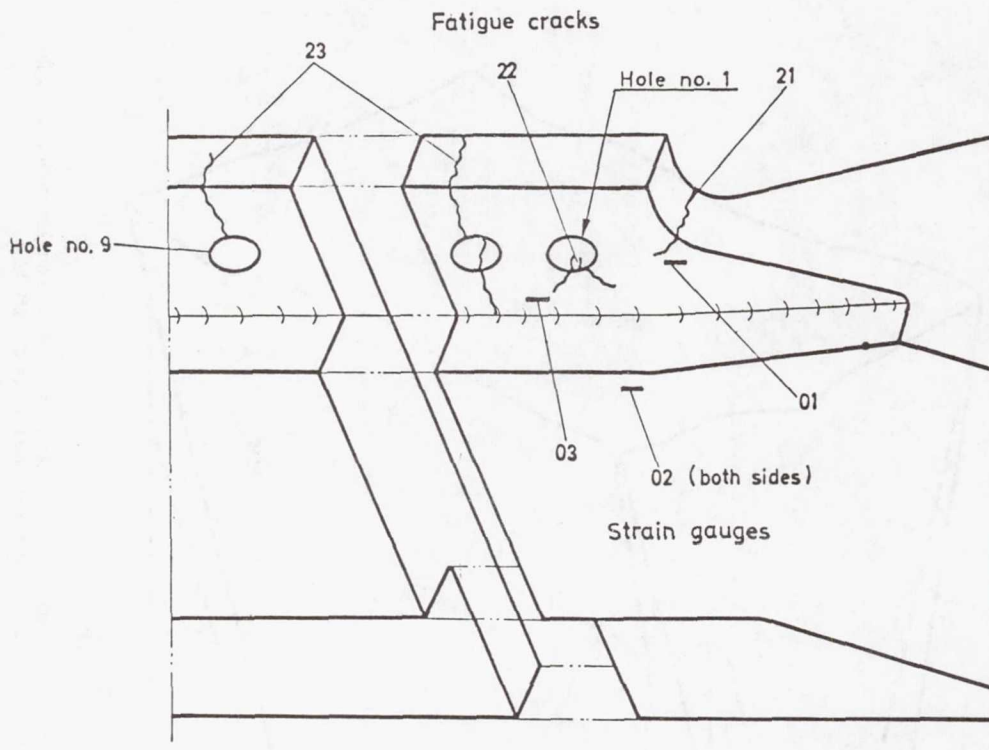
Test specimen A<sub>2</sub> with cracks found.
